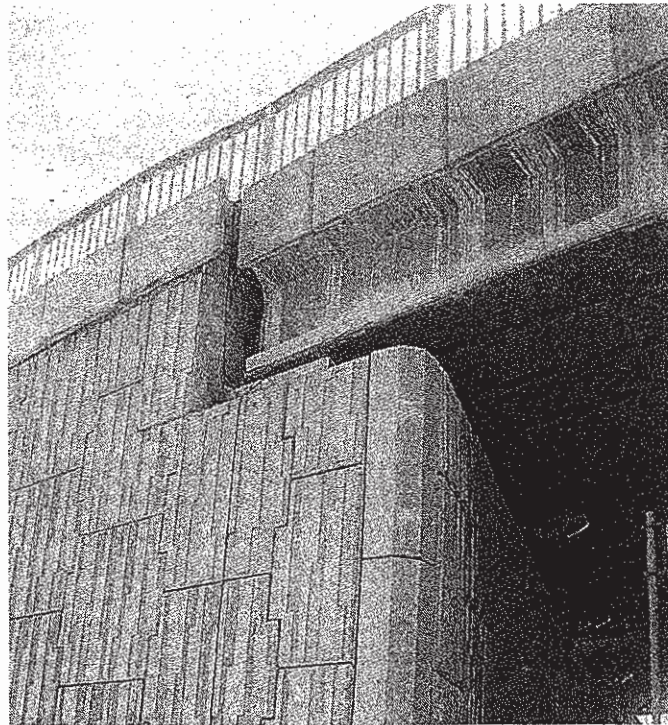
Detail of the bridge beams resting on the Reinforced Earth Wall
